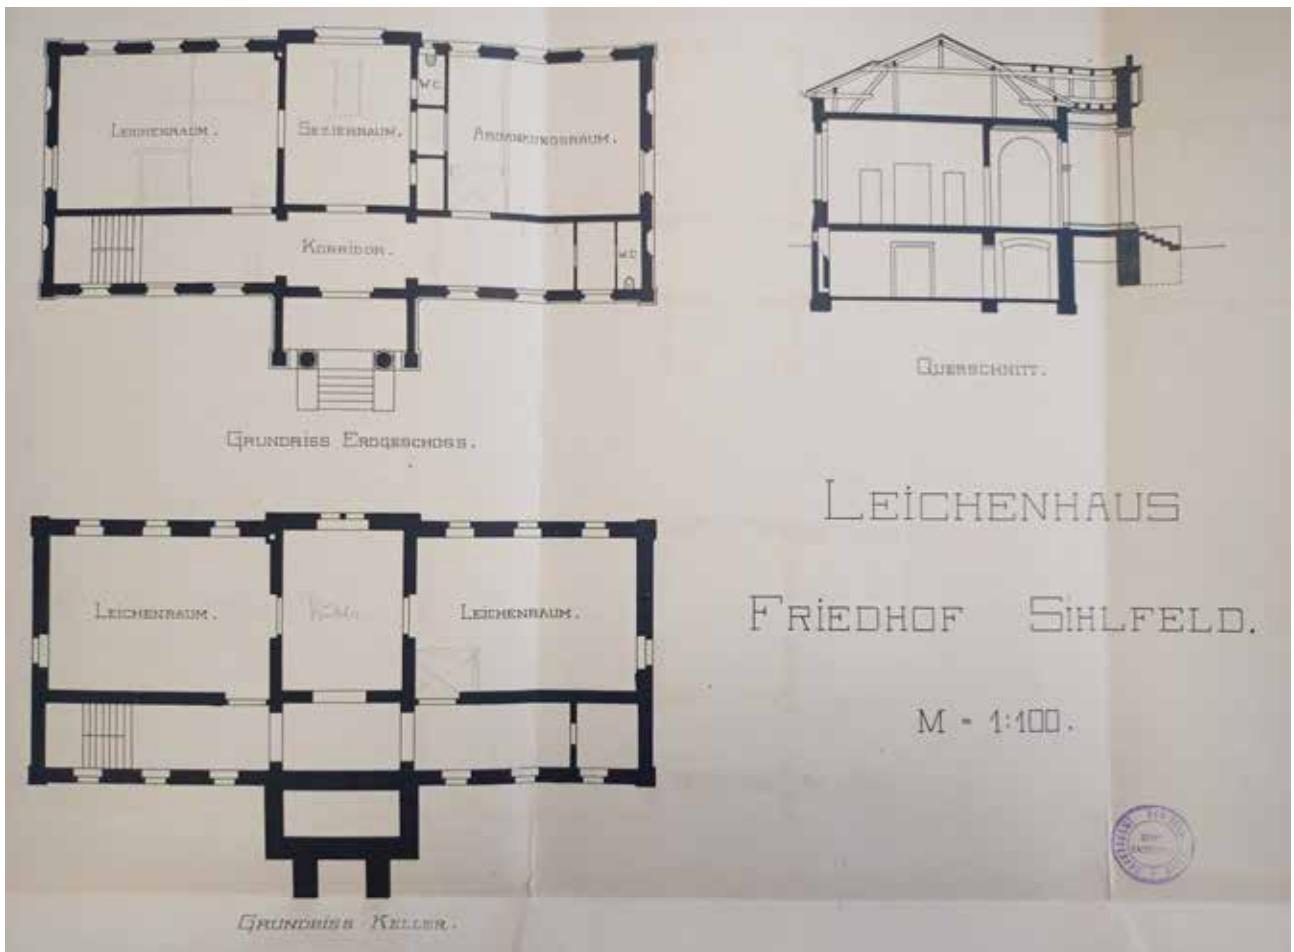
New Mortuary Plans. Archive Stadt Zurich (1898). [Plans]
